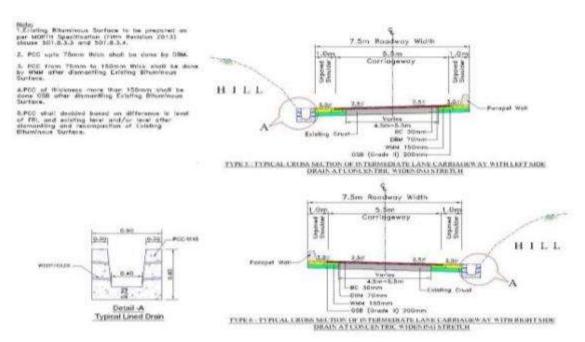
Typical Cross-Section of intermediate Lane carriageway with (Left/Right side drain) at concentric widening Stretch
